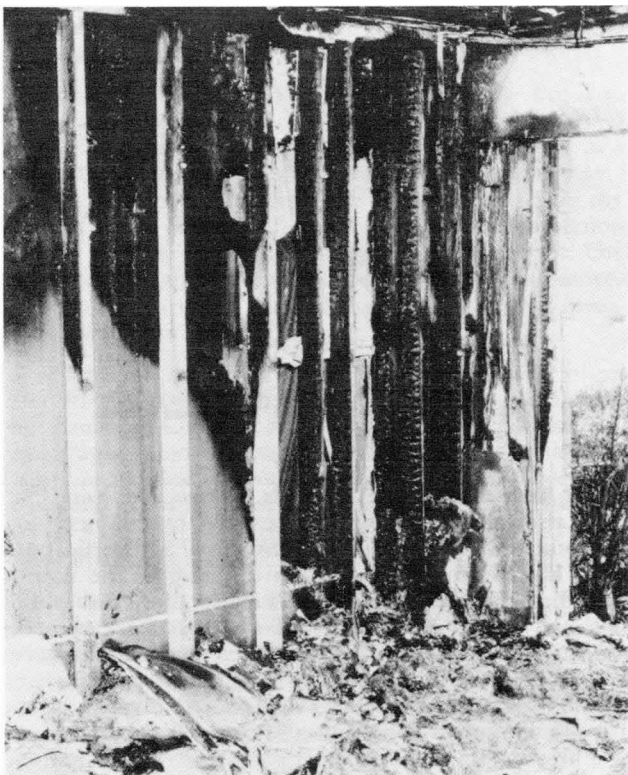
Typical “V” pattern showing wall and wood stud damage.
